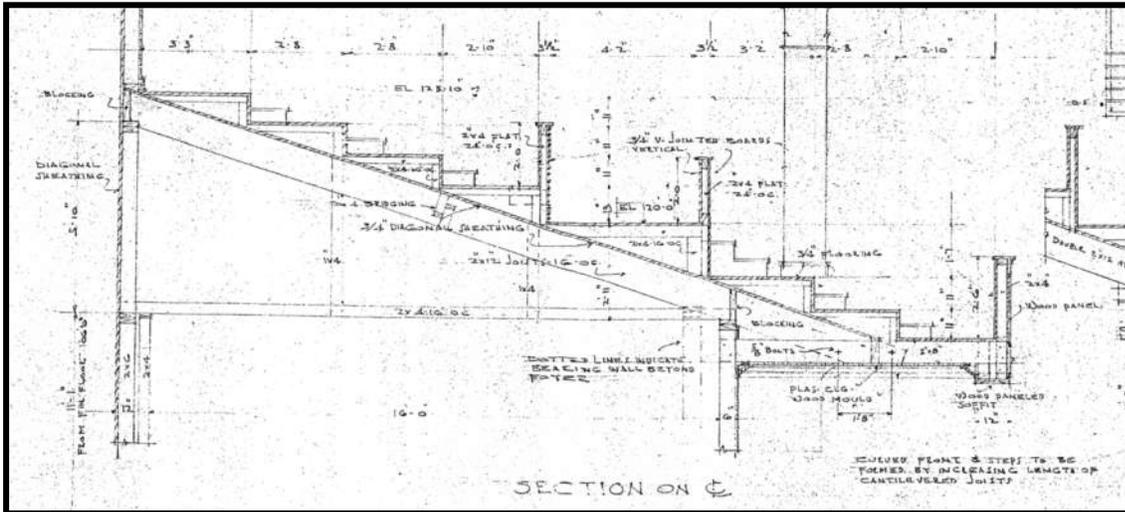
Section illustrating the Balcony framing from the 1938 Construction Drawings.
